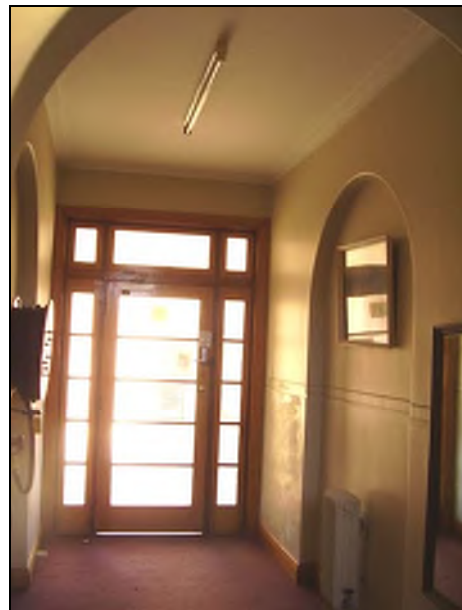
The ground floor corridor which has simple rendered walls with profiled dado detail and concrete slab ceiling over.
